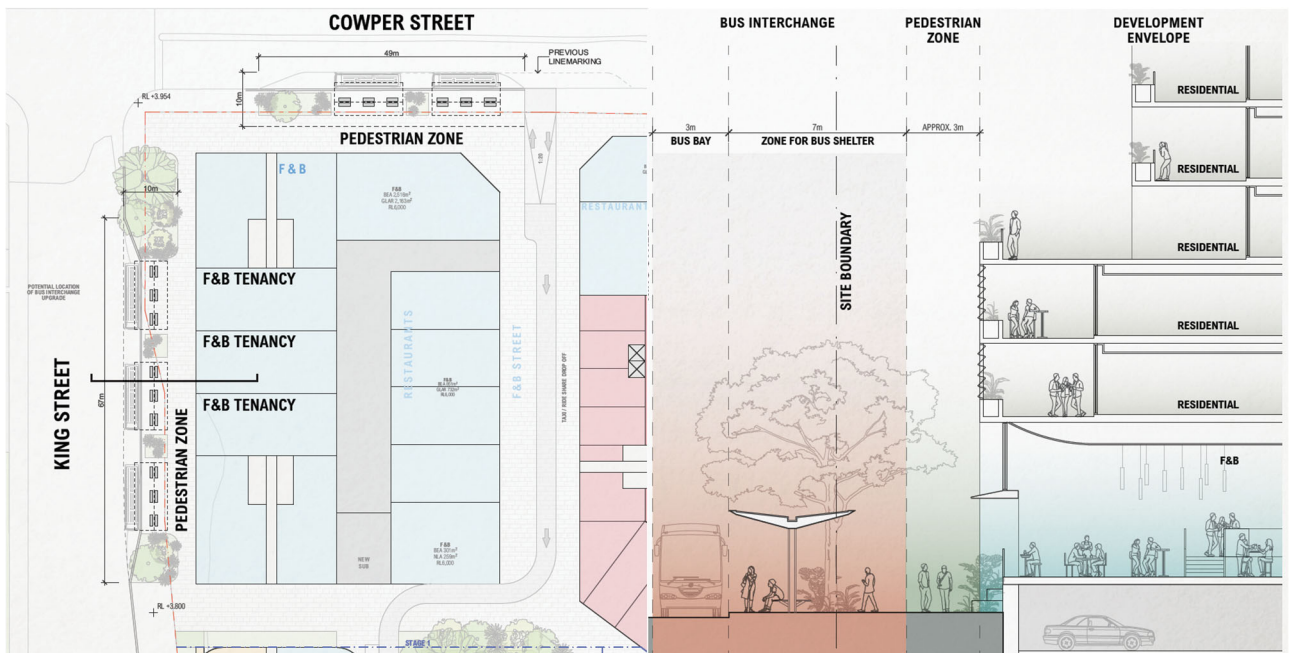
Illustrative plan and street section showing potential Cowper/King Street bus interchange
